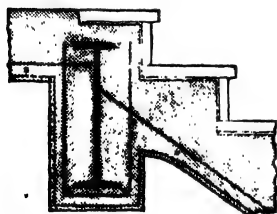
Reinforced Concrete Stairs, U.S.A. Government Printing Office, Washington.
